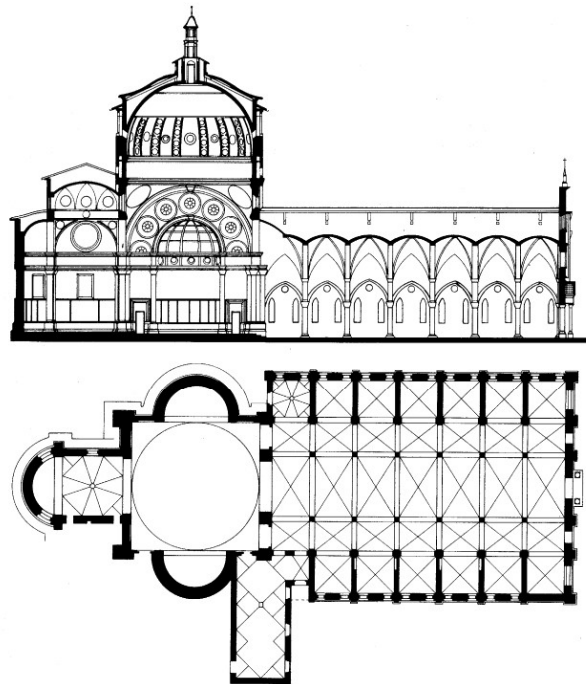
Plan and section of the church of Santa Maria delle Grazie at Milan
